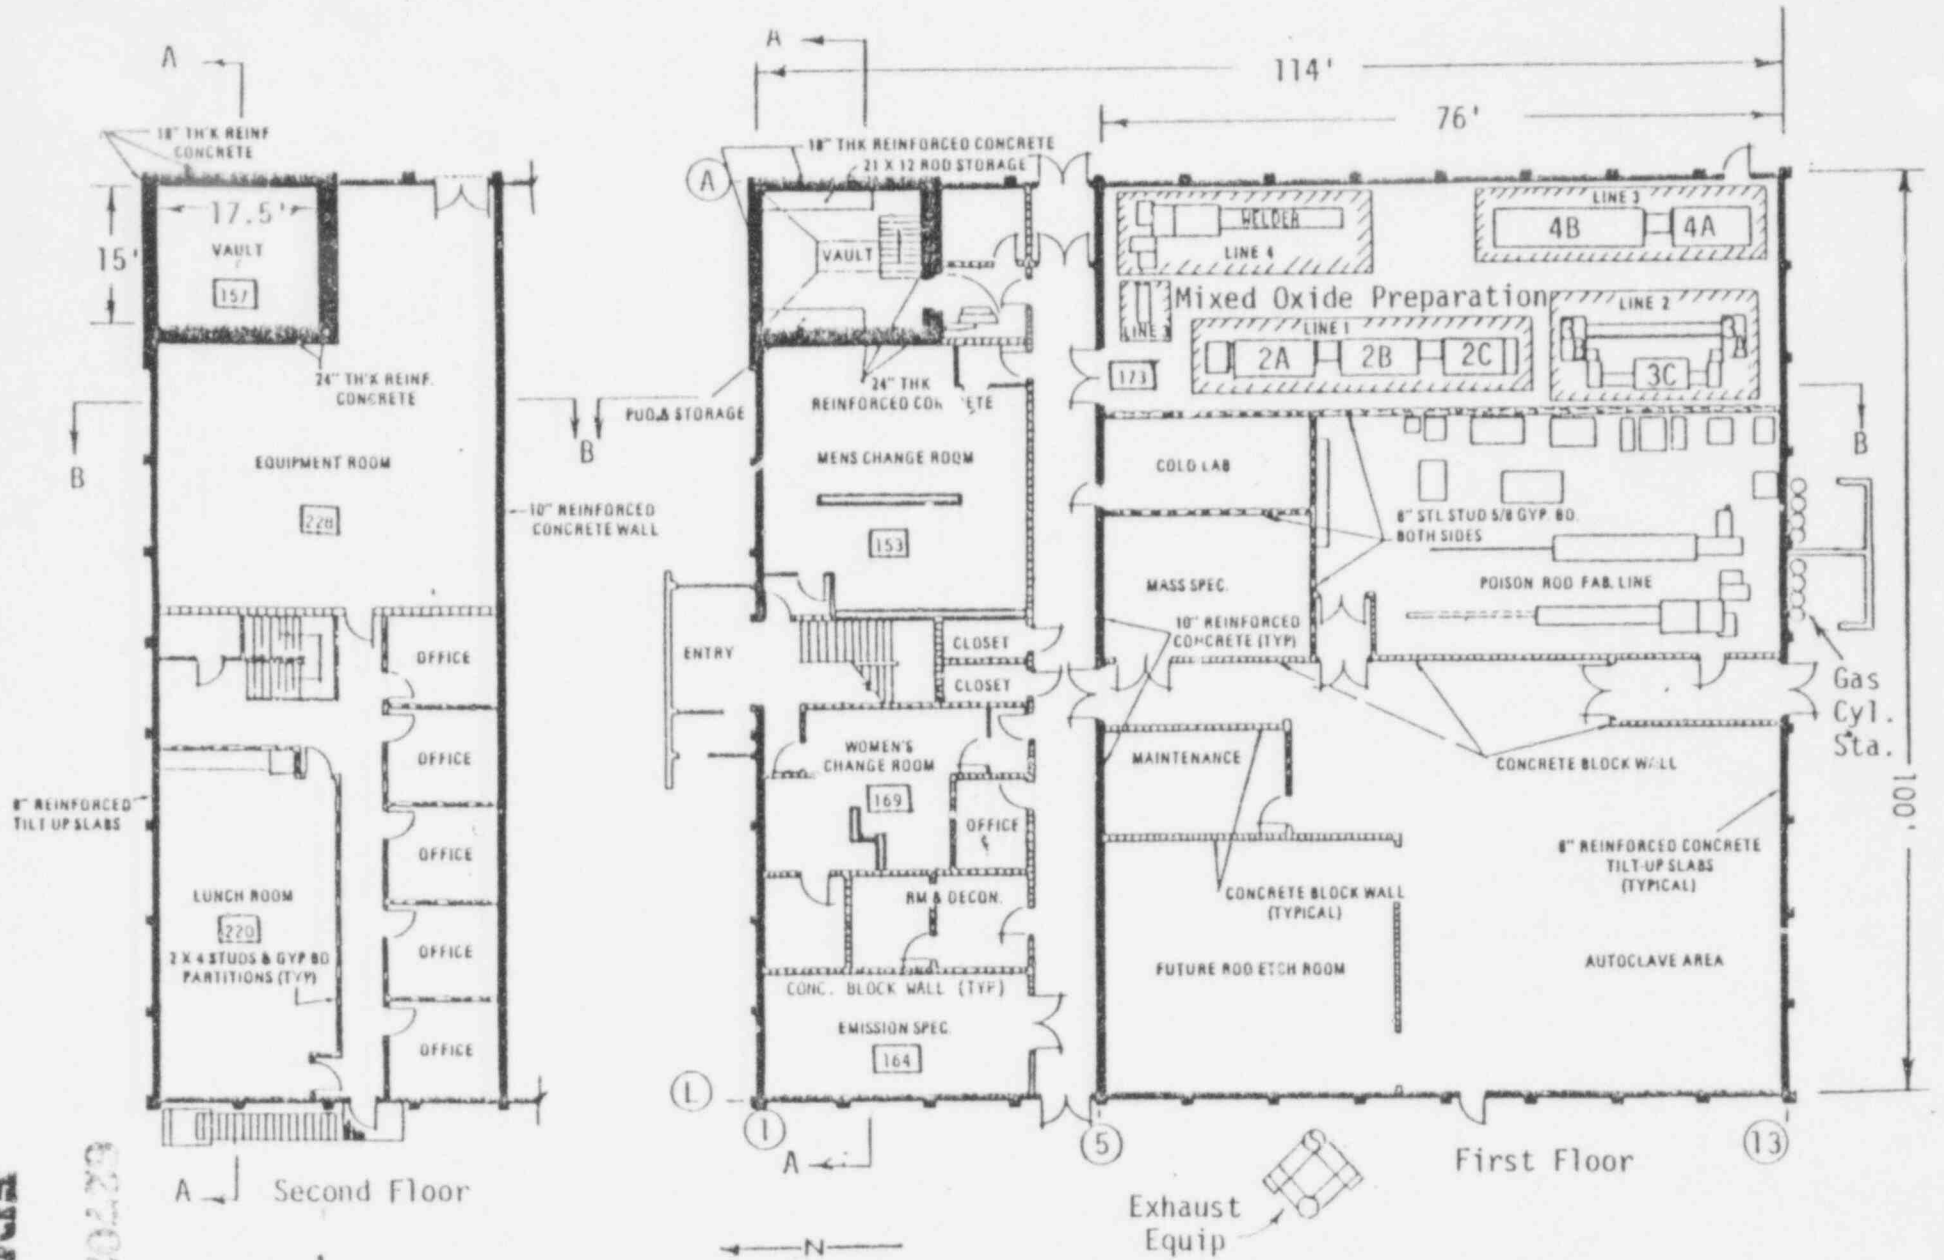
MOFP BUILDING FLOOR PLAN
